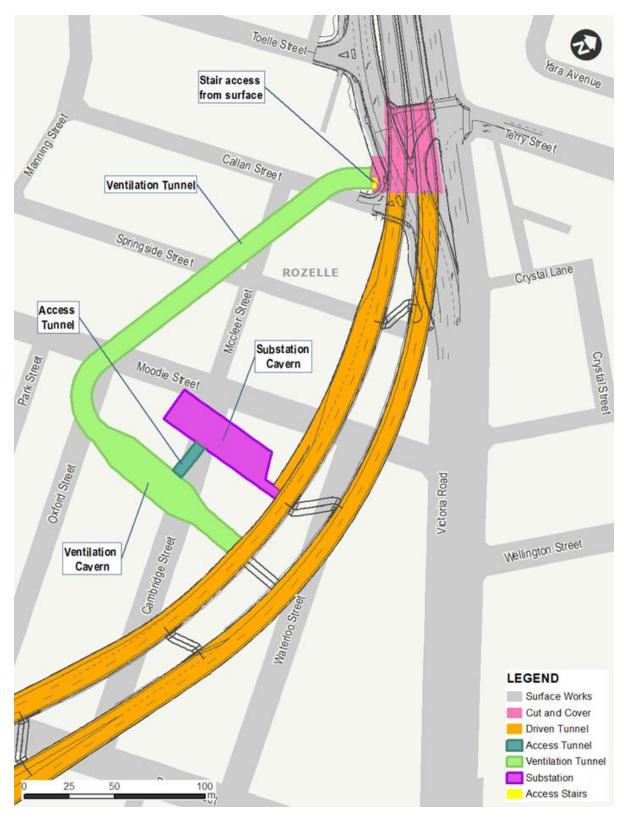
Proposed ICL Ventilation Ancillary Facilities – underground layout
